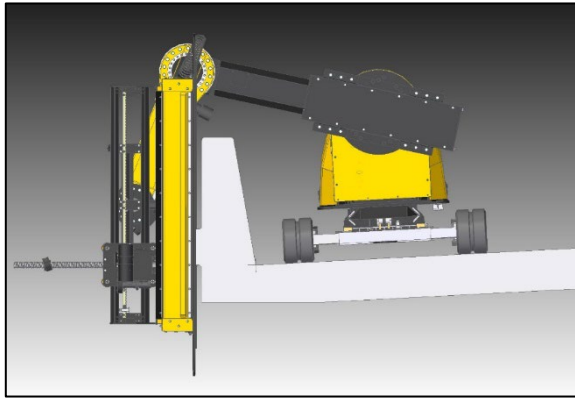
3D Model of CONJET 557 operating on a typical parapet wall
